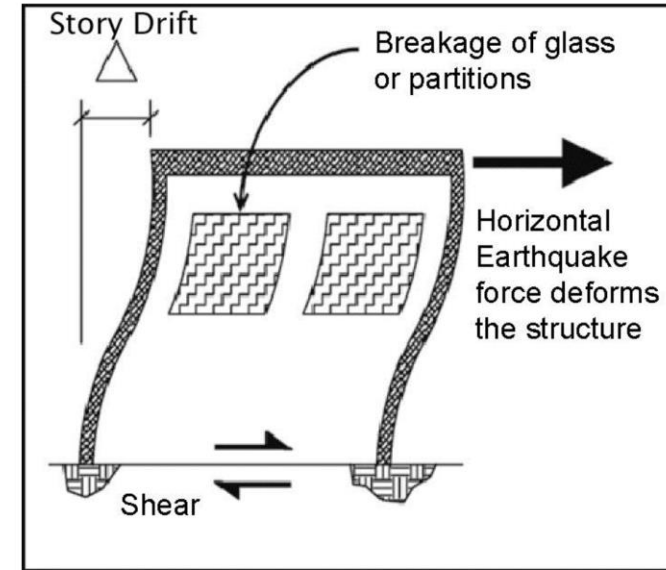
Nonstructural damage due to building deformation.
